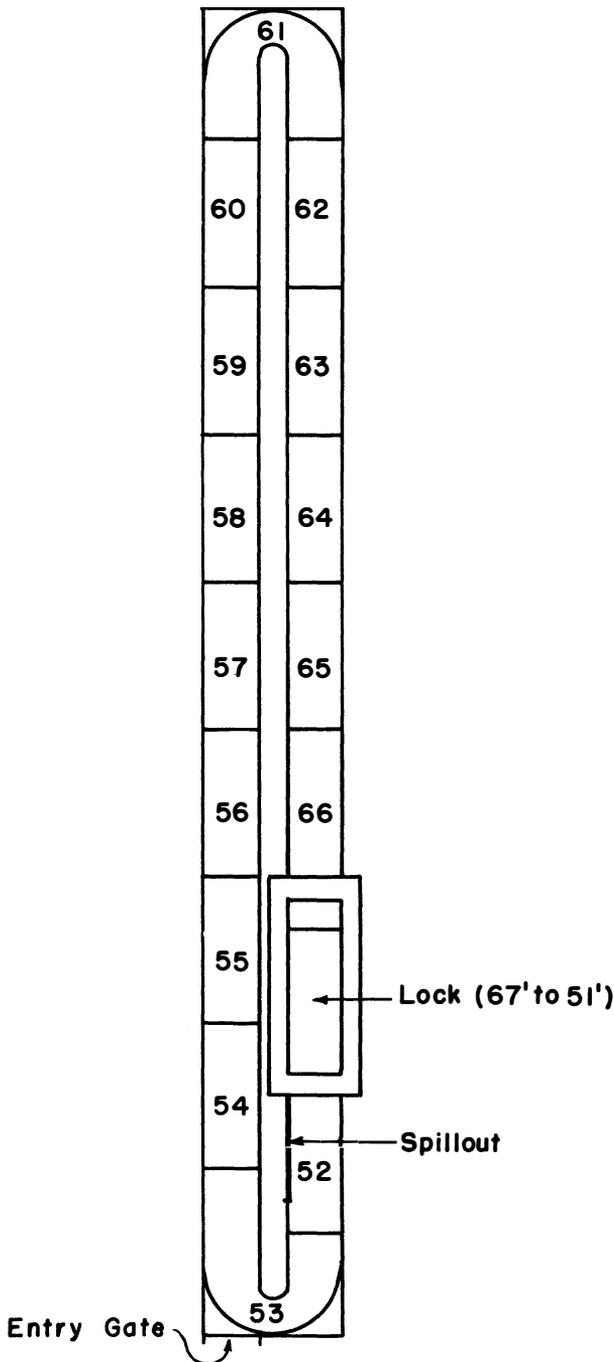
Plan view of 1-on-8-slope fishway showing pool elevations in height above mean sea level.
